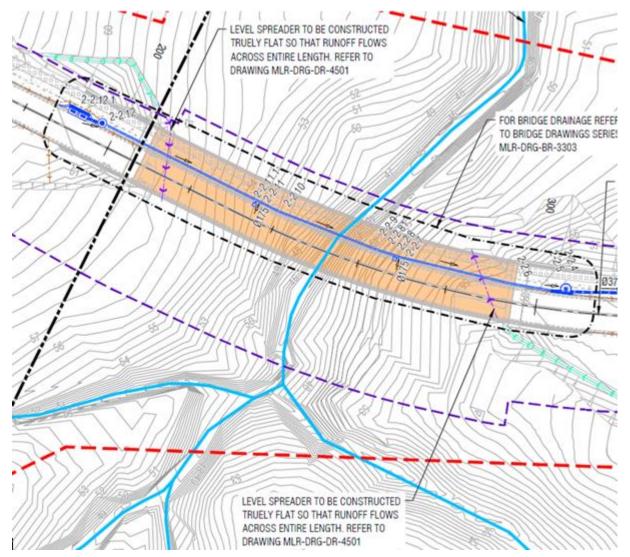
Figure illustrating the location of two swales (level spreader) beneath a proposed bridge being designed for Matakana Link Road (this image should not be used for construction). Each of the Project Packages will review whether the construction of an irrigation swale or similar is practical for the bridges being constructed.
